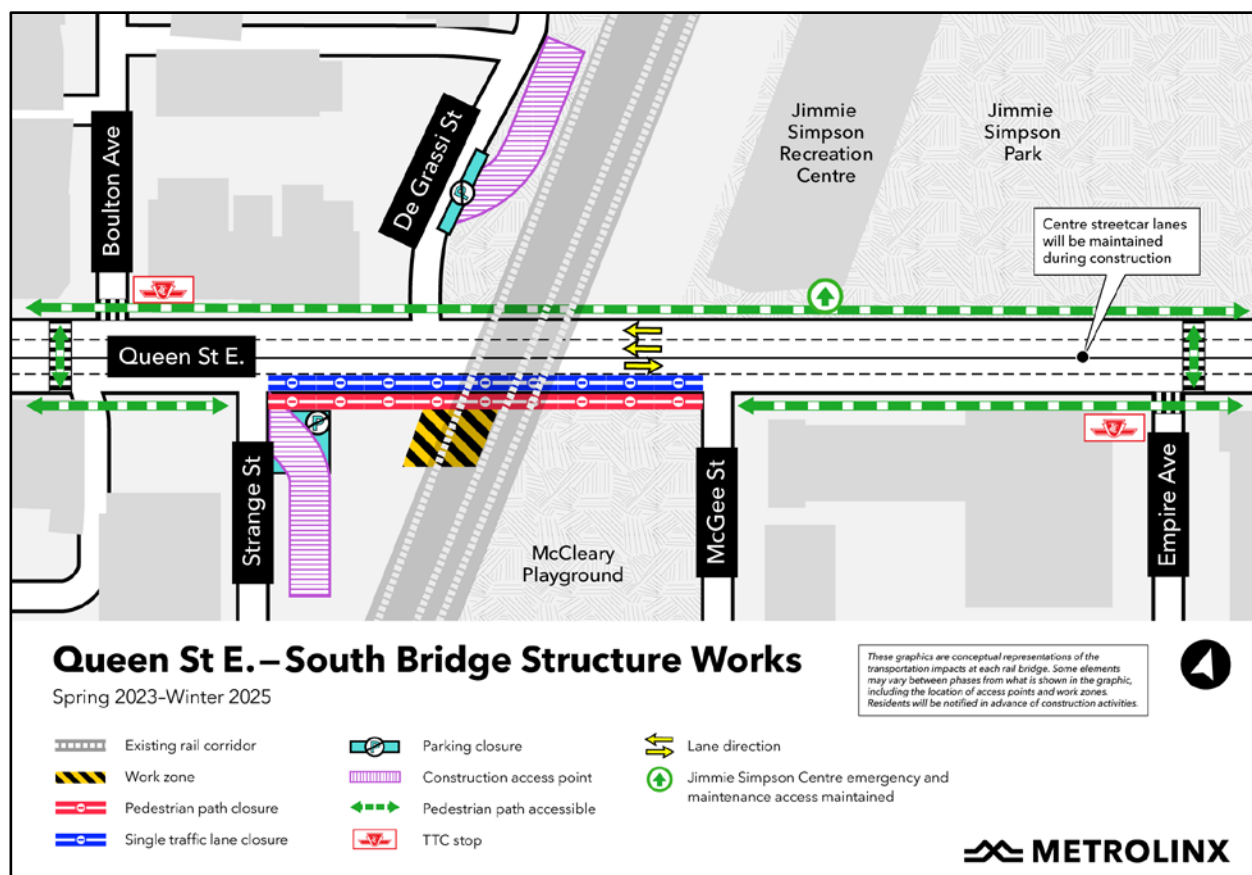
Queen Street Traffic Management during South Side Bridge Structure Works Source: Metrolinx
